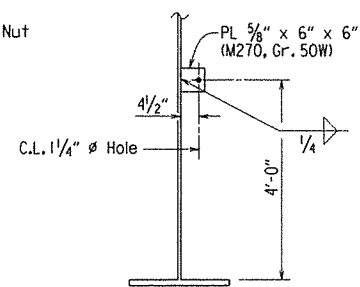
DETAILS OF FIELD ERECTED SAFETY HANDRAILS
